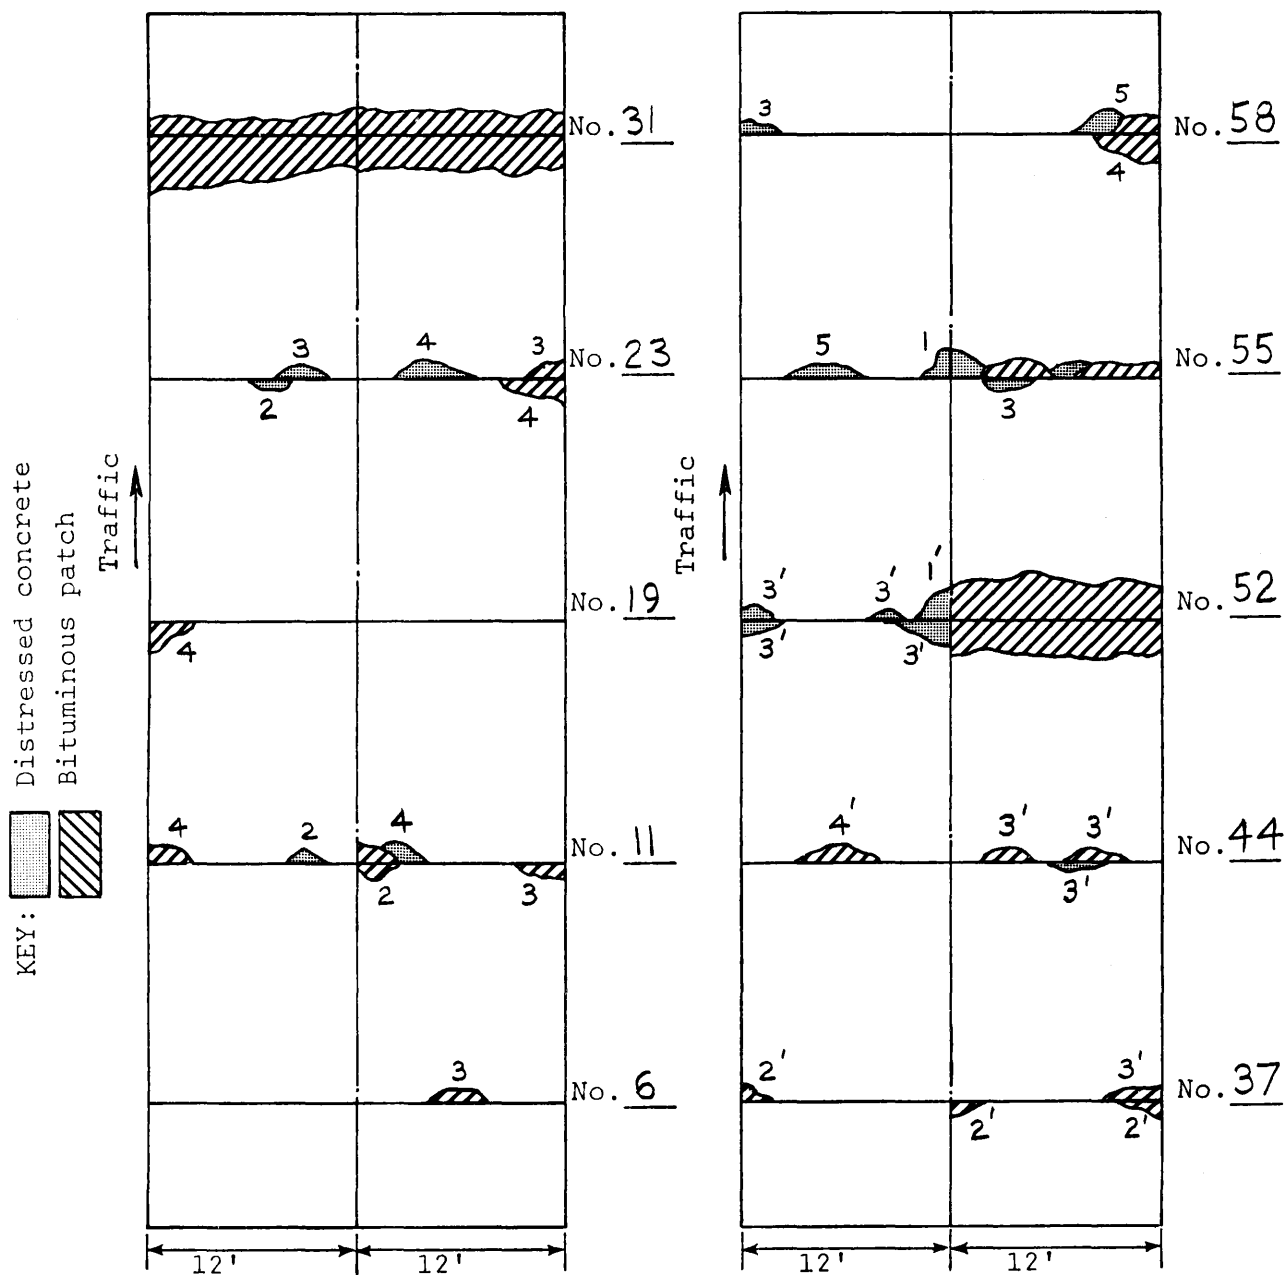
Typical plan of distress at transverse joints in PCC pavements.
